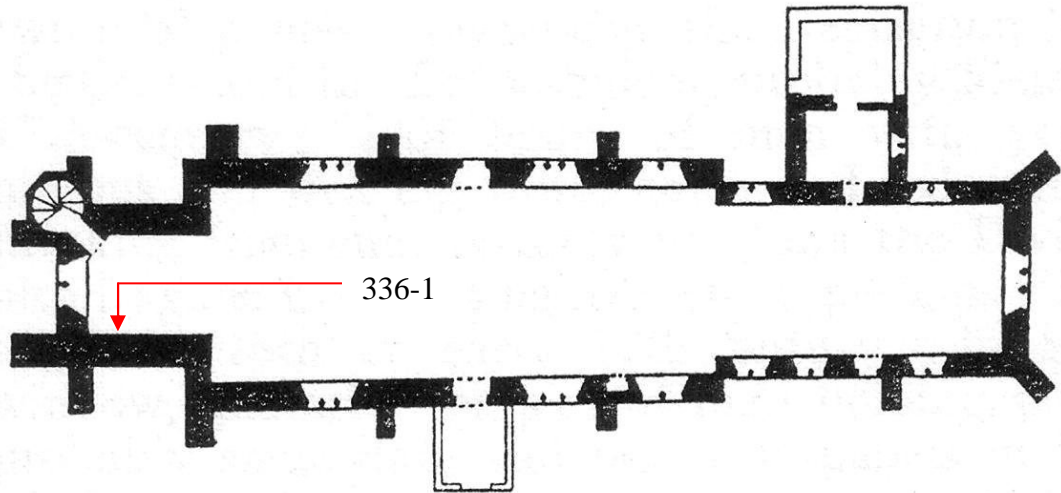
Sampling location in Springfield church. Note that this plan only shows the ground floor of the church and that the sample was collected from the belfry of the church tower (RCHME, 1921, 218).
